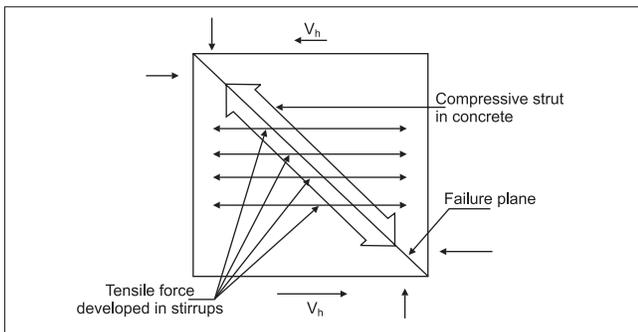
Horizontal shear resistance in a beam-column joint<sup>17</sup>
